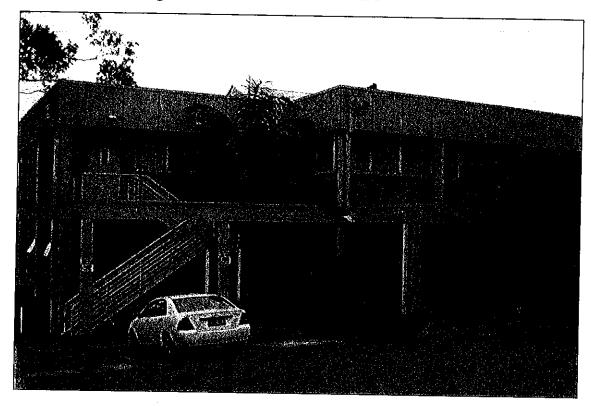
Asbestos Cement Wall and Ceiling Lining to Building
